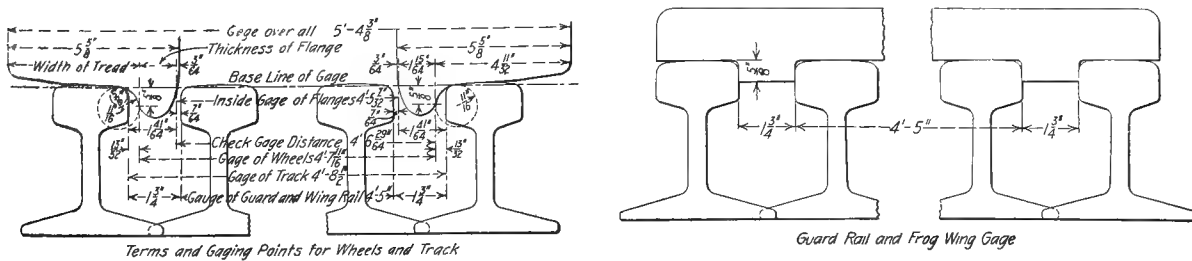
Wheel and Track Gages. (M. C. B. Sheet 16.)
